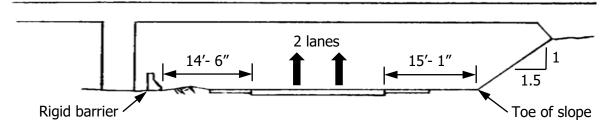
Bridge elevation view of horizontal clearances for a 2-lane, 1-way highway feature below the bridge, with a rigid barrier.
